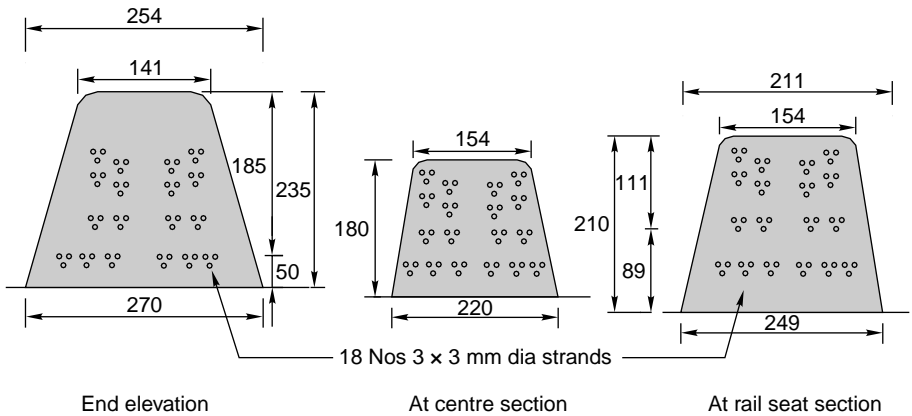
PCS-12 mono-block concrete sleeper (units in mm)
